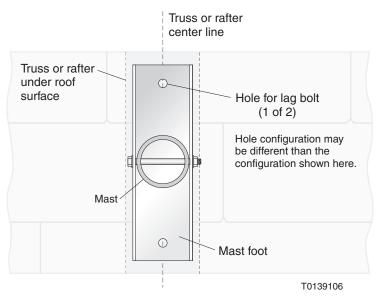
Aligning the mast foot on the truss or rafter center line (wood-frame roof)
